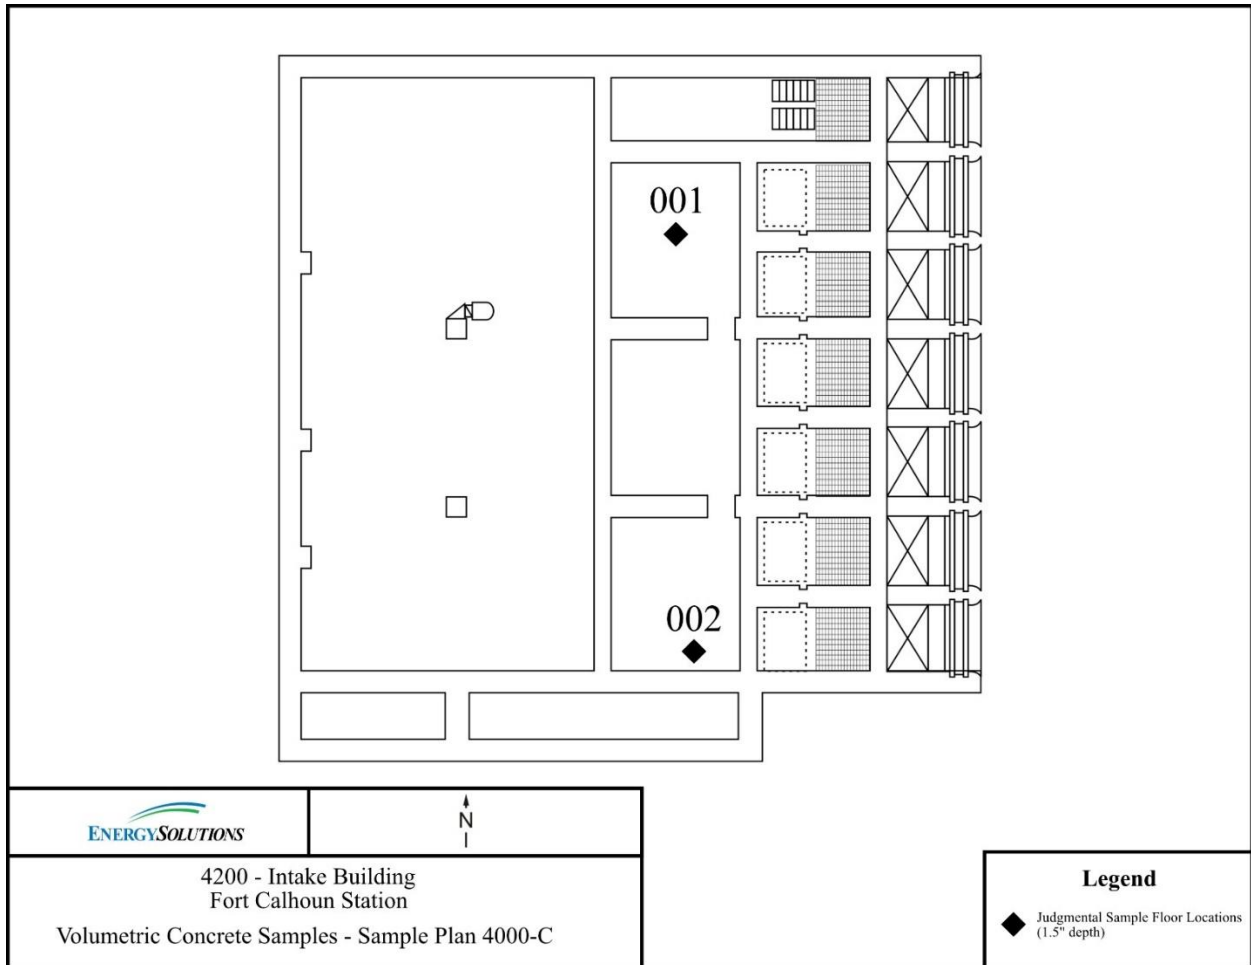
Volumetric Concrete Sample Location in Intake Building Basement
